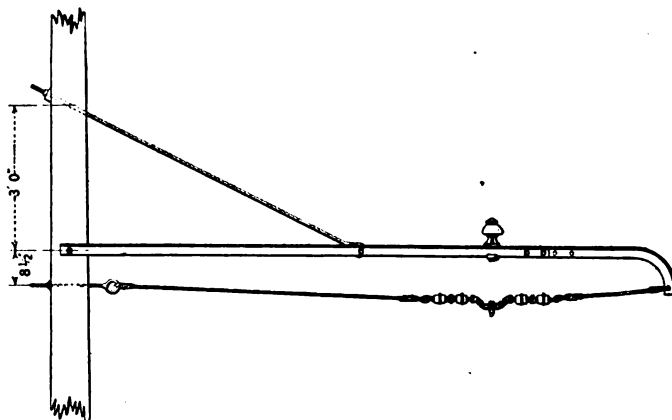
TROLLEY WIRE STEADY—BRACKET CONSTRUCTION
